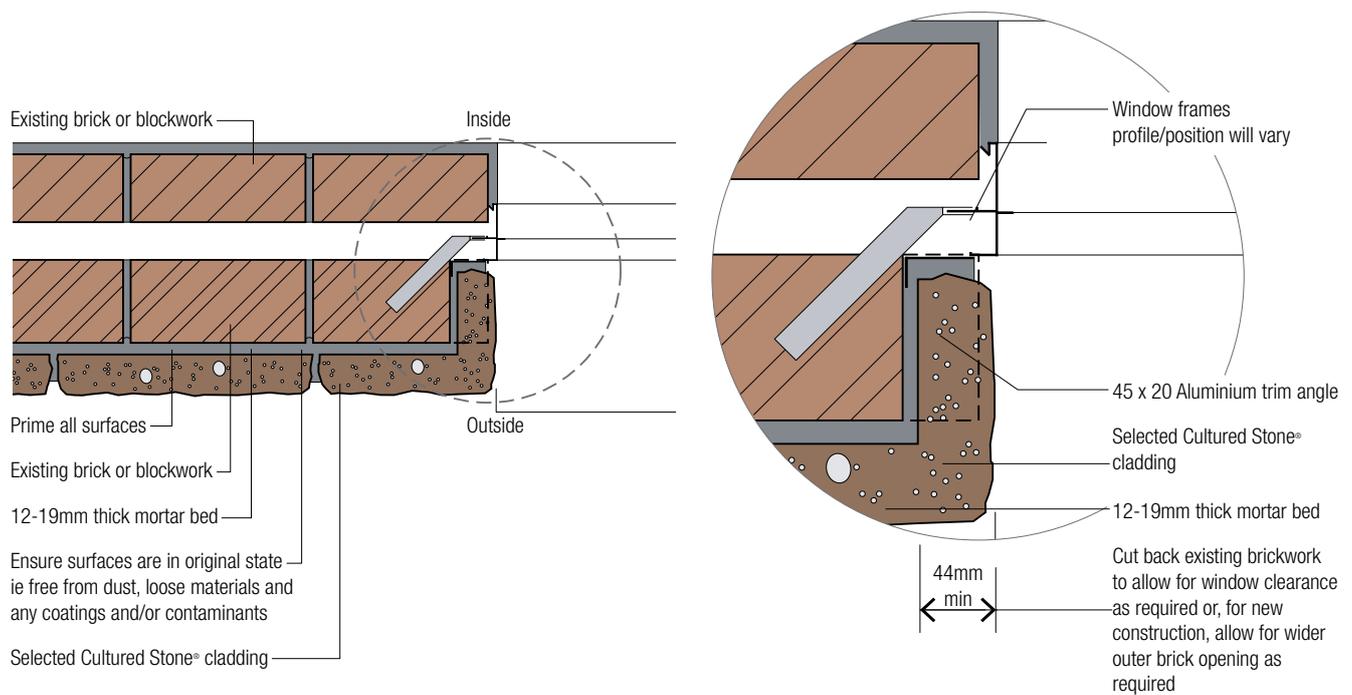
Typical External Existing Application - Plan (Dwg # CS-08.02)
